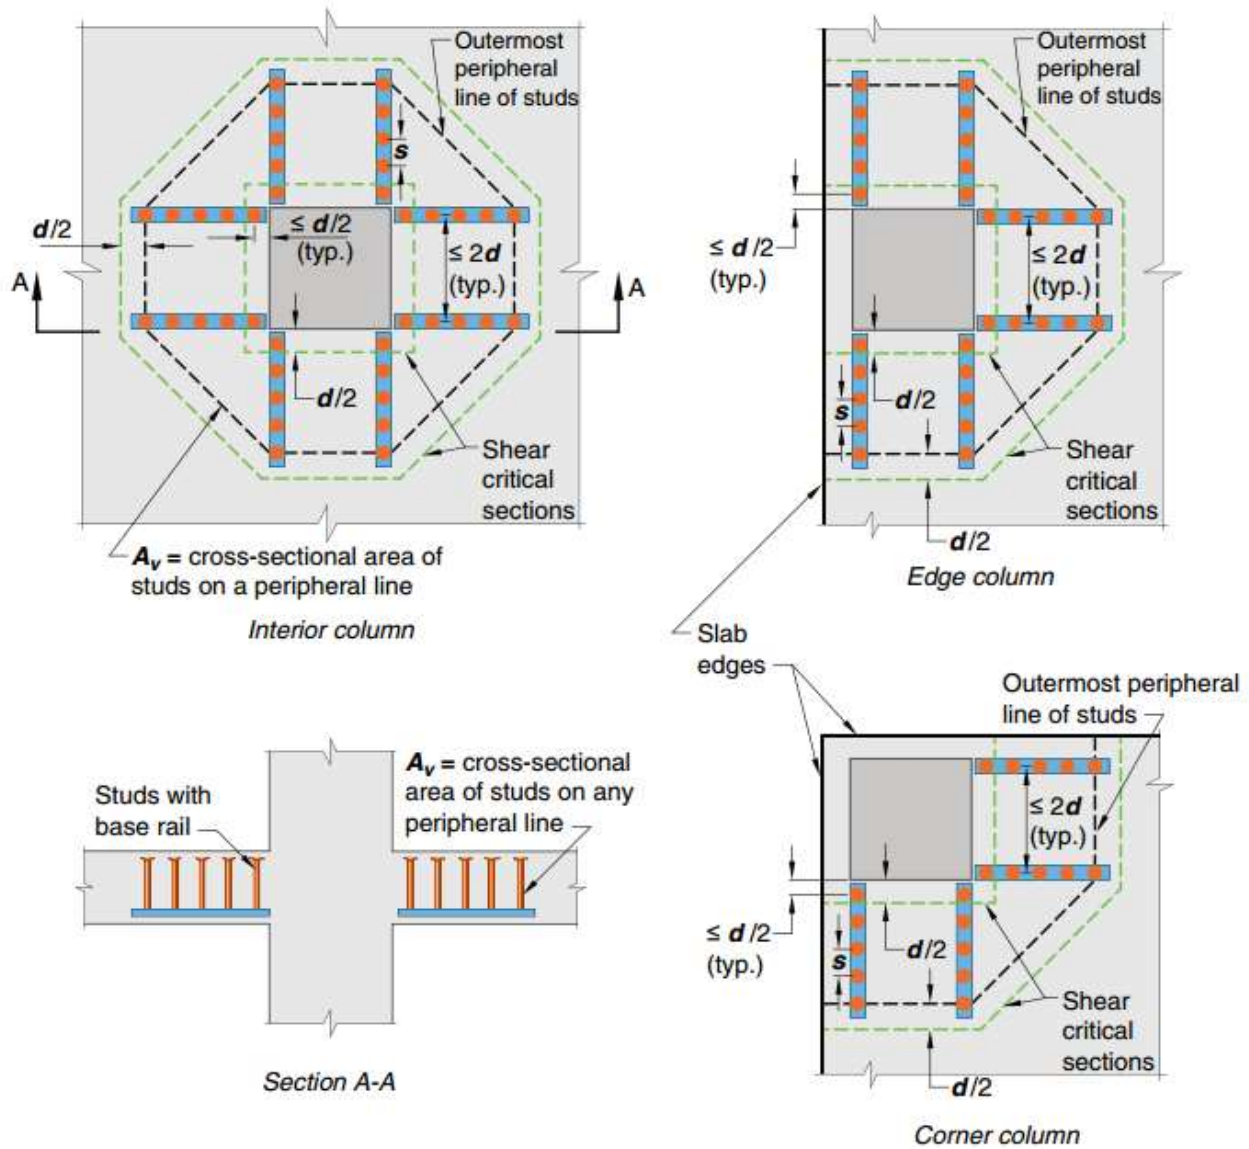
Typical arrangements of headed shear stud reinforcement and critical sections.
